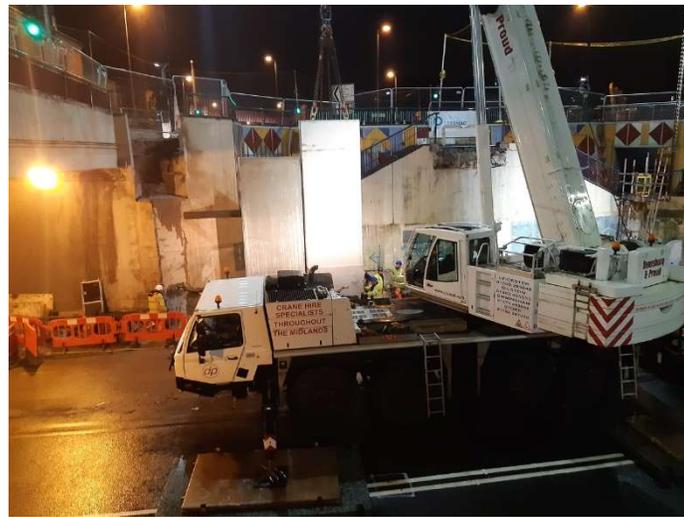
Installation of OSM abutment panels, panel positioning [Photo courtesy of Tarmac]
